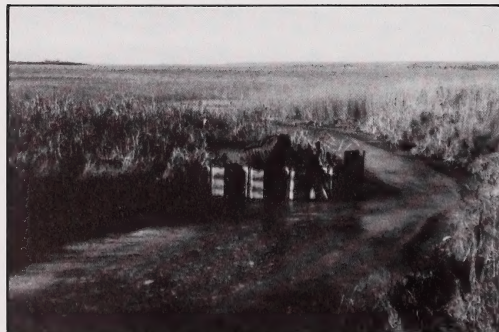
Remaining Control Structure at the man-made outlet. Looking west towards Wabamun Lake (Photo taken November 15, 1987).
